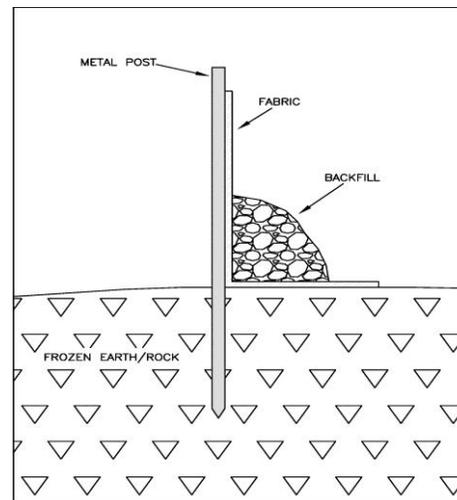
Properly Constructed Silt Fence for Frozen Earth or Rock
